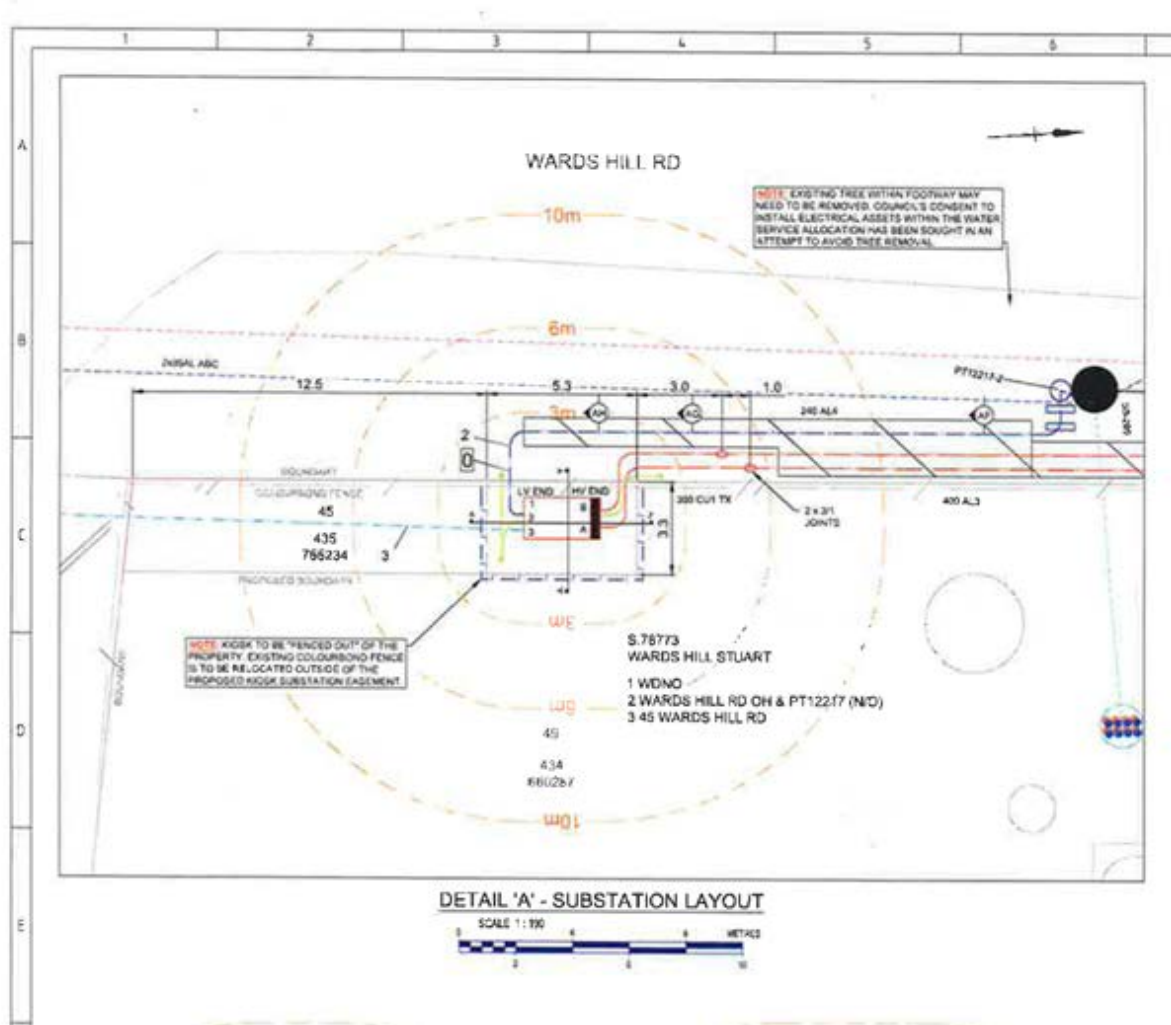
Location of proposed electrical kiosk substation. Kiosk size 1.45m wide X 2.7m long X 1.7m high.
